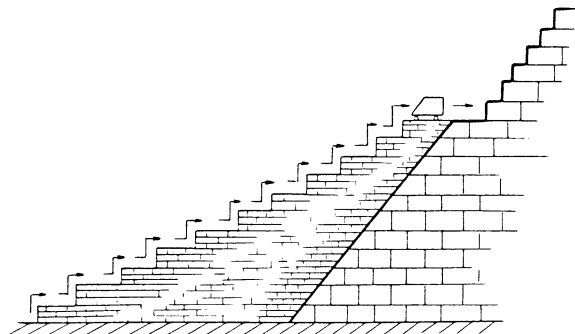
Unkeyed stepped addition to angle-faced structure.
